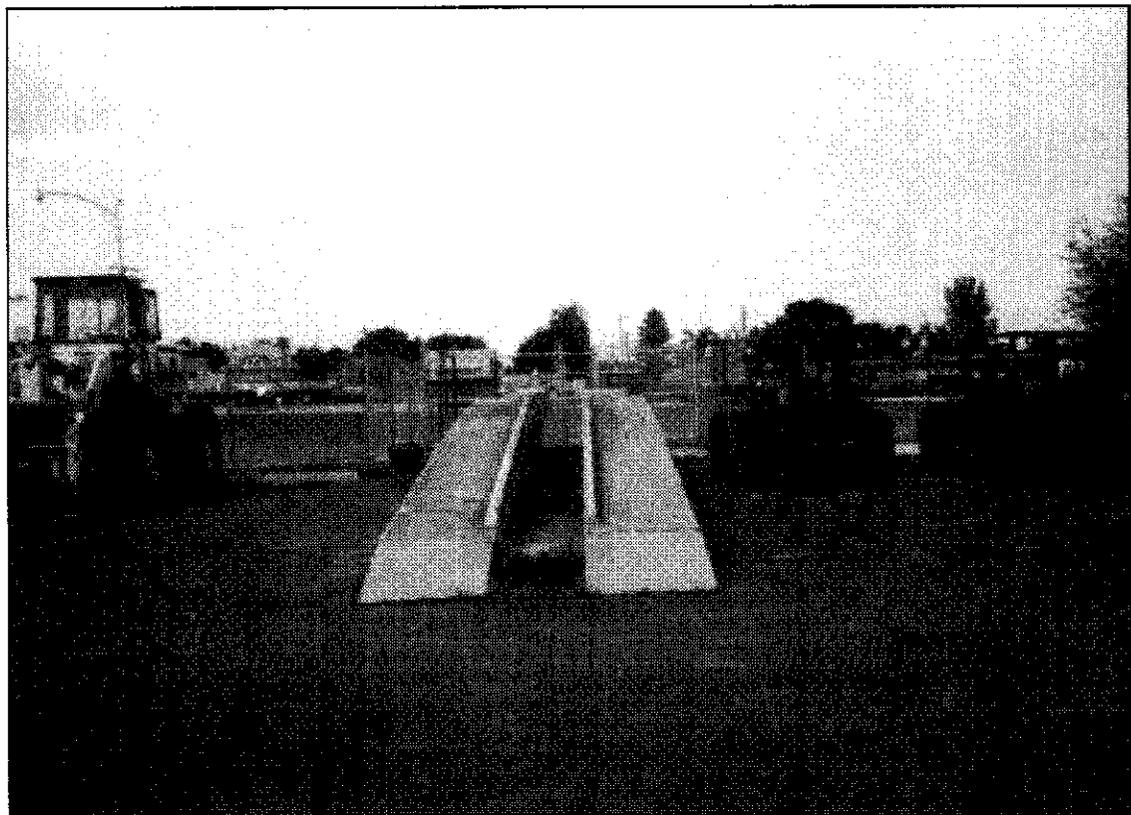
SSG Roy Clifton Scouten USARC Concrete Ramp, facing north.
